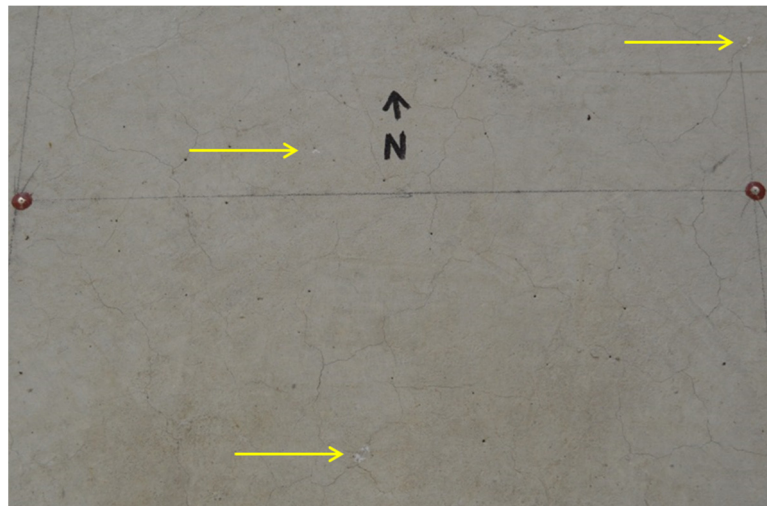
Map cracking and efflorescence on the top of a slab. Yellow arrows indicate areas of efflorescence.
